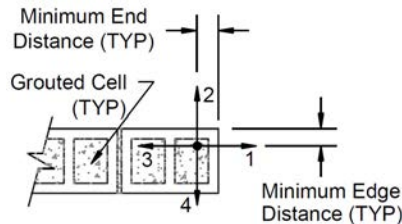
ILLUSTRATION OF SCREW-BOLT+ ANCHORS INSTALLED INTO GROUTED CONCRETE MASONRY WALL
